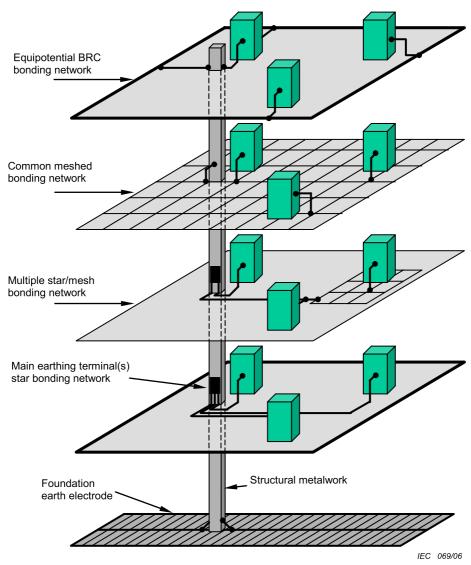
R16 – Example of equipotential bonding networks in structures without lightning protection systems
